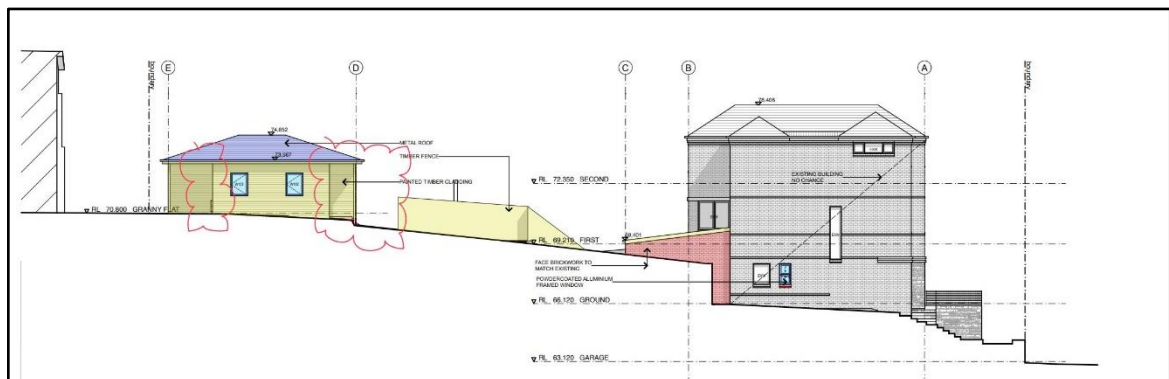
West Elevation (Rev B), 2/11/2023 (Fortey & Grant Architecture)
